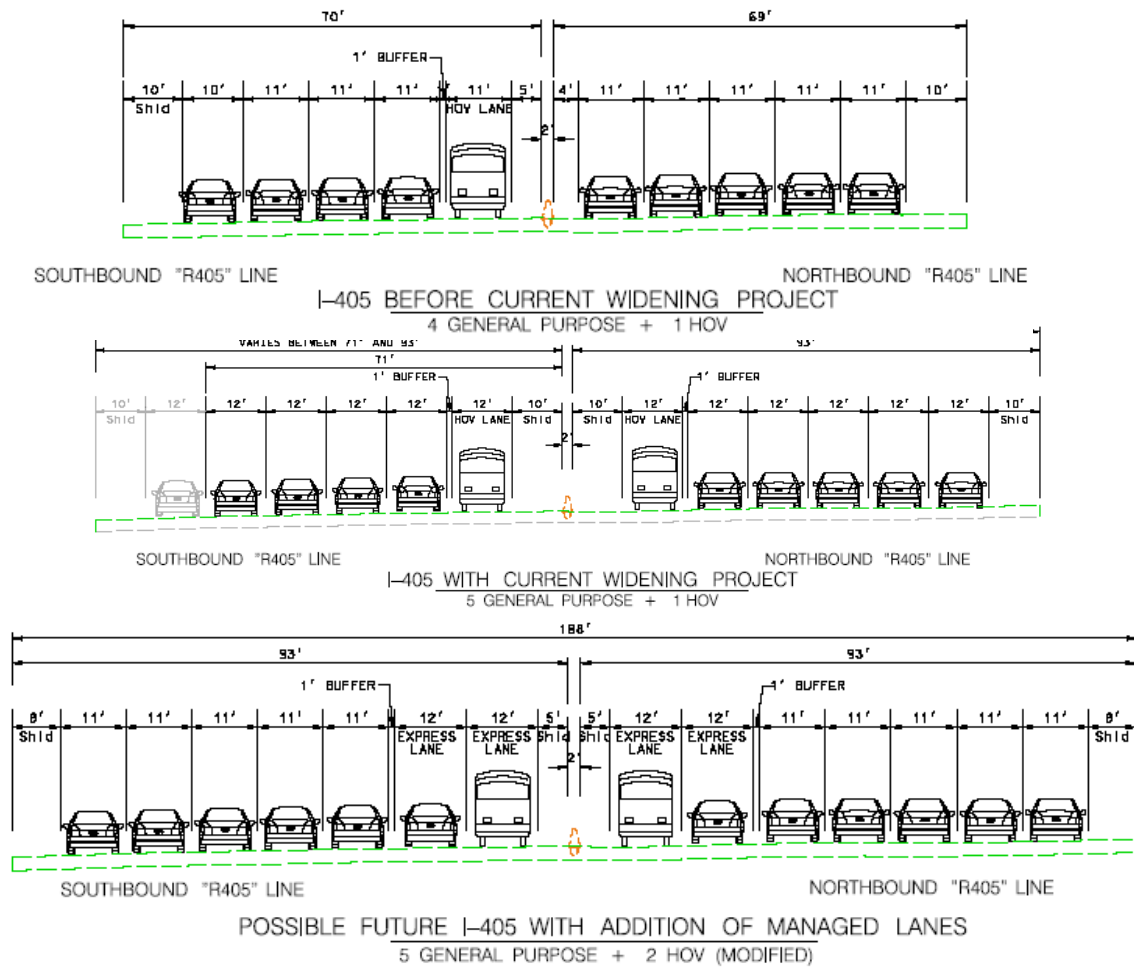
illustrates three current cross sections within the Sepulveda Pass as well as the future changes that are currently being implemented or could be possible with Concept 2.
